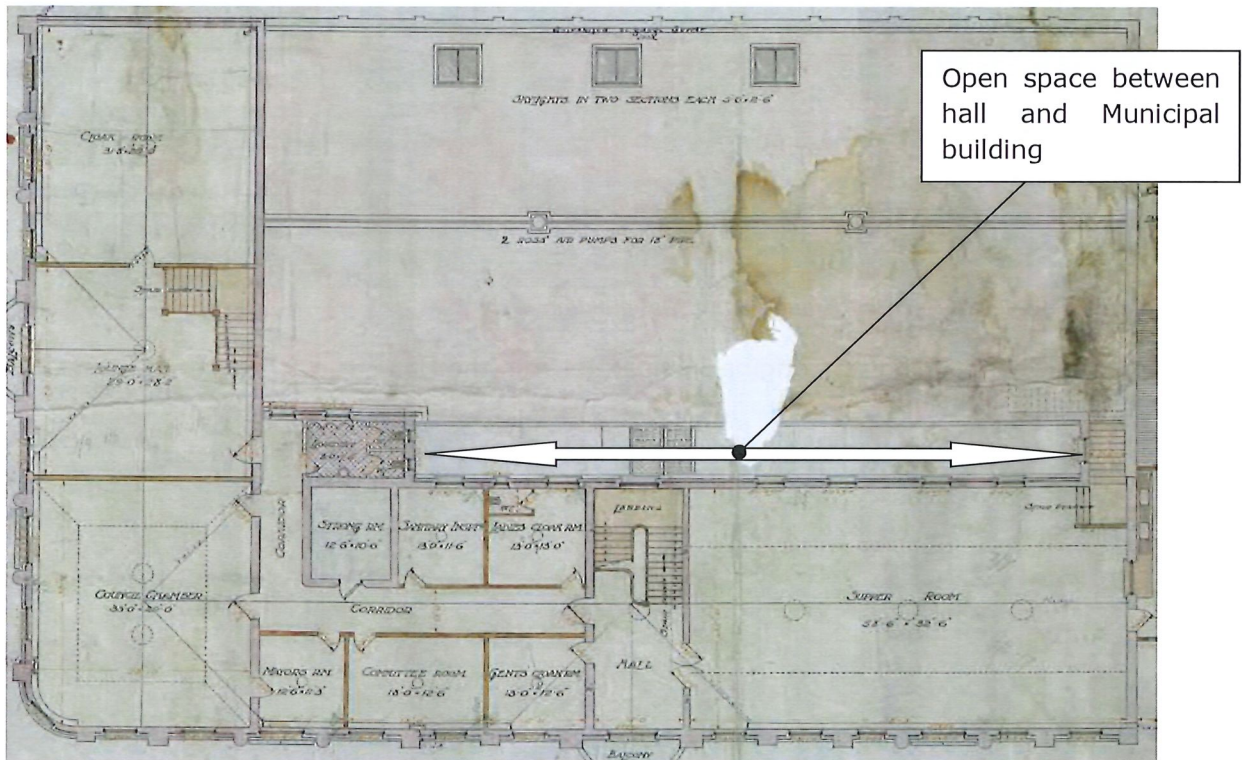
Original 1915 First Floor Plan – note space between hall and offices
